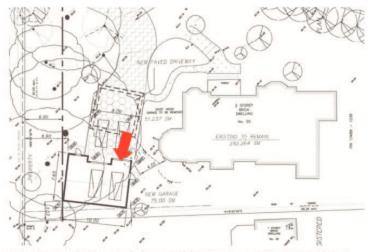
Site plan showing the location of the new garage. [Richard Min Architect]
